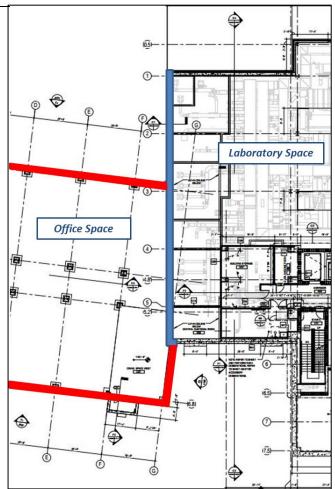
Foundation Wall Line G (Courtesy of Stantec)
